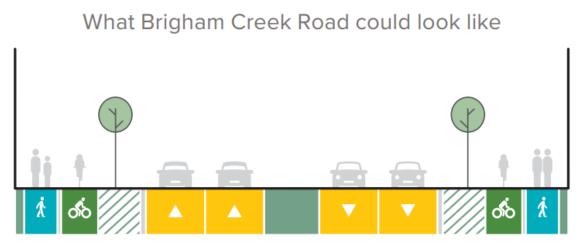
Potential Brigham Creek Road Layout (Source: Supporting Growth Alliance)
